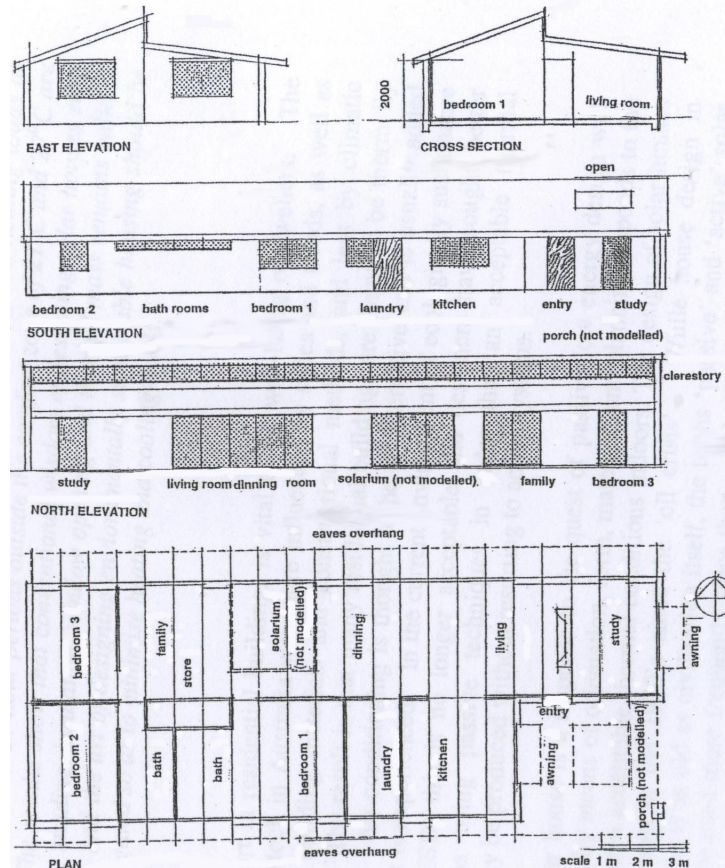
Plan, section, and elevations of the test house (Lim and Williamson, 1999b).
